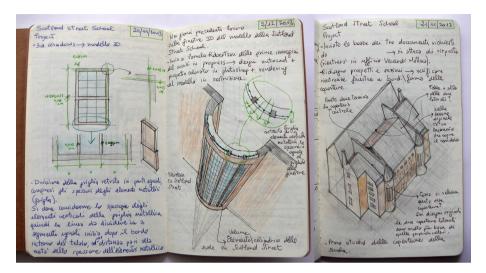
Sketches and notes from a personal notebook to interpret the standard windows, the glazed surfaces of the towers, and the shape, ridges and slopes of the pitched roof (Source: Personal archive of the author).
